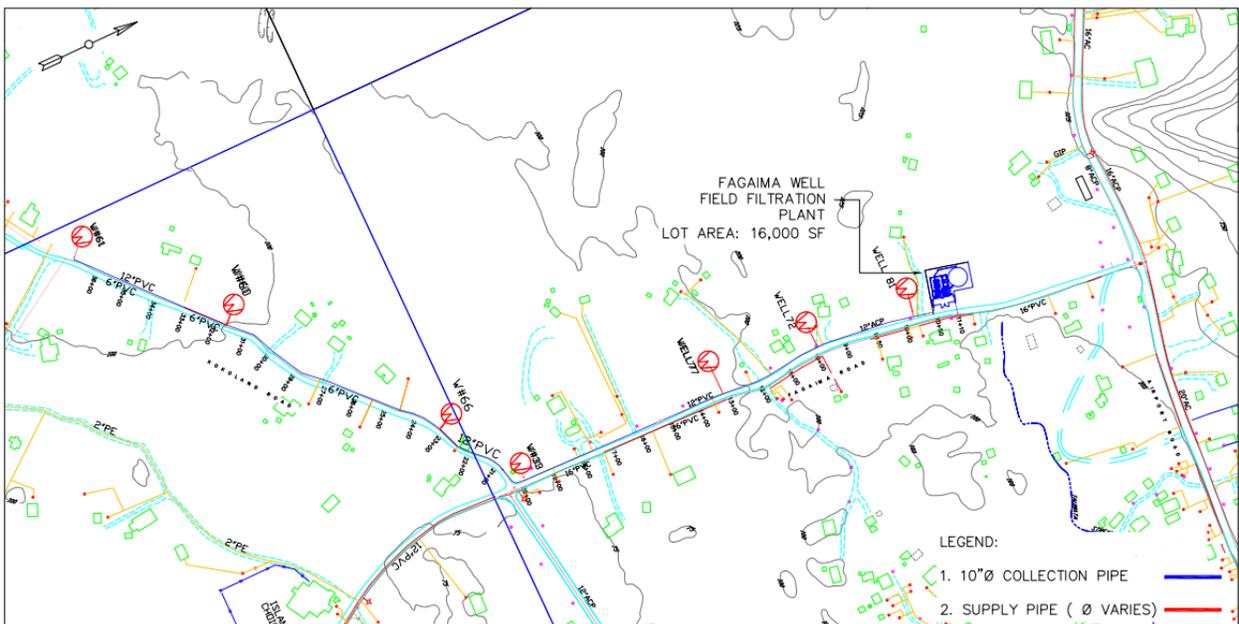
Fagaima Well Field Filtration System Site Development Plan
